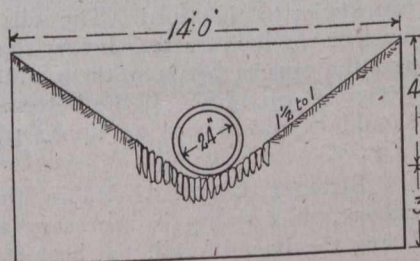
Type of Concrete End Wall and Paving Used with Culvert Pipe.
